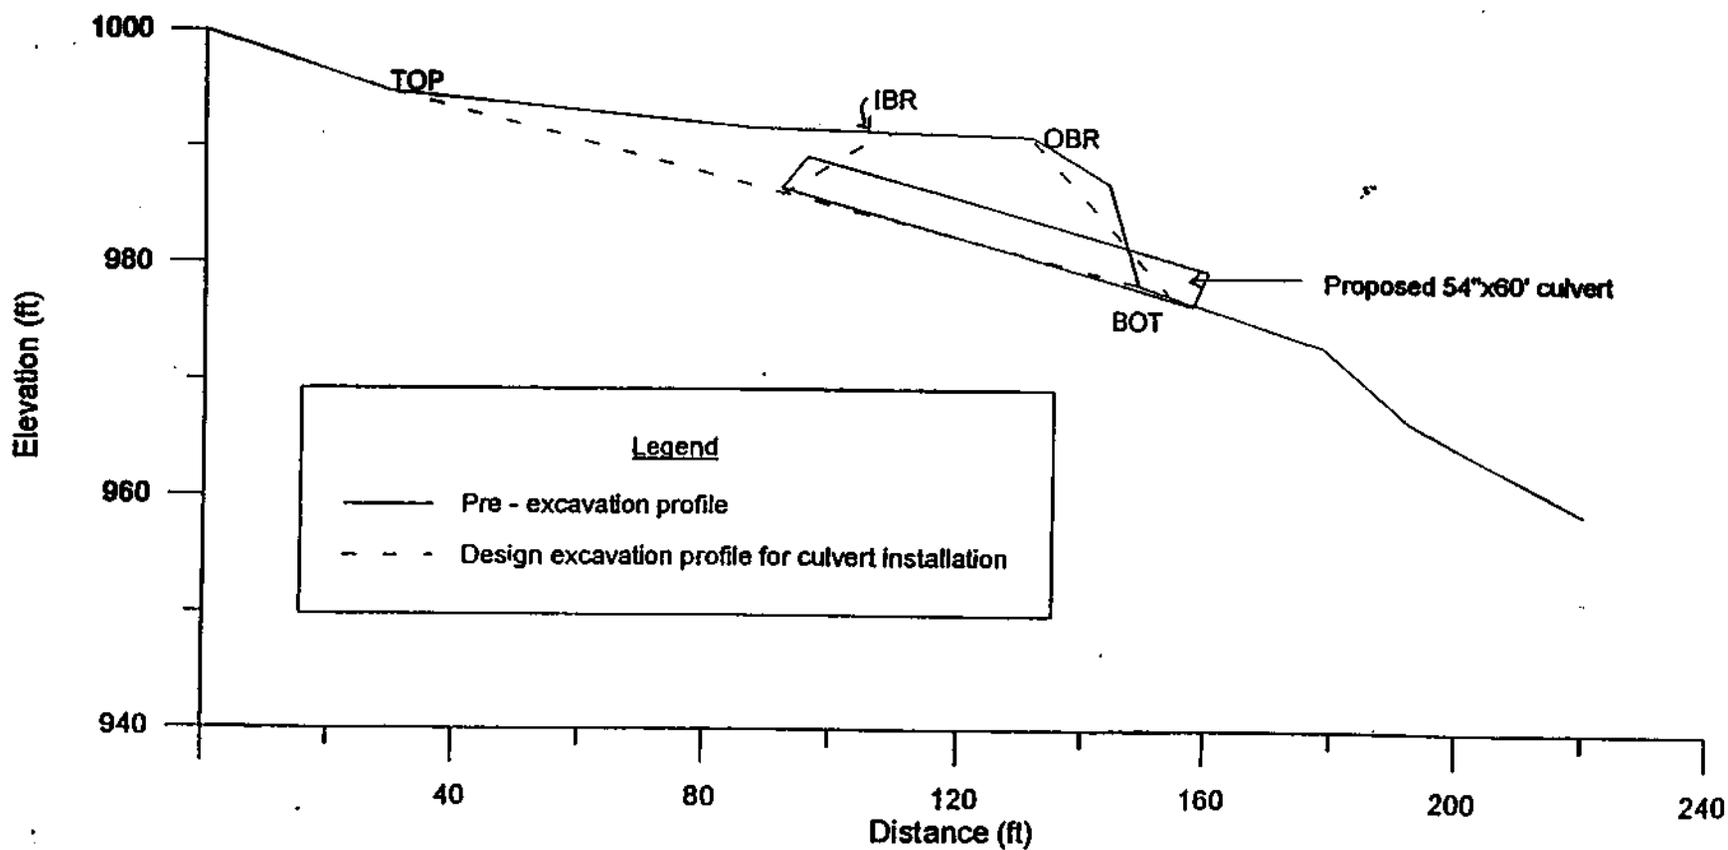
Butler Road: Site 5 Stream Crossing Pre & Design Excavation Profiles.
